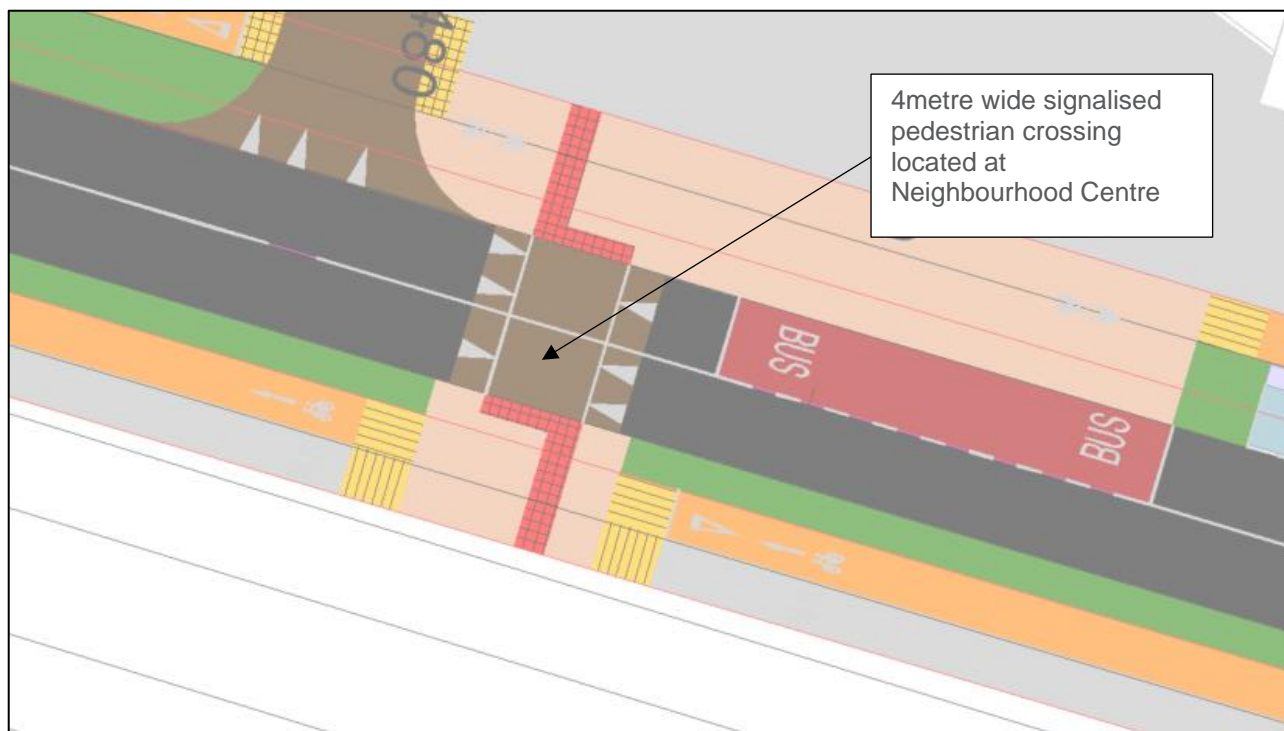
Example of a Typical Raised Crossings Along Berryfield Avenue
